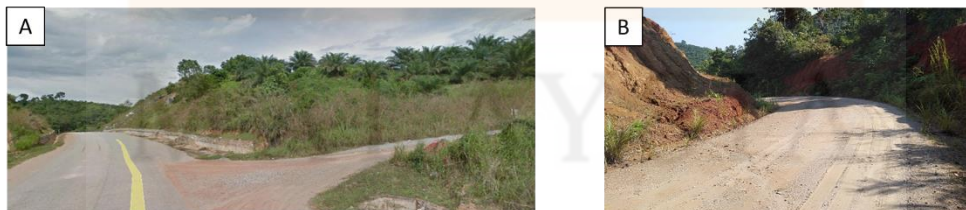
Road Connection (A) Main Entrance (B) Unpaved Road
